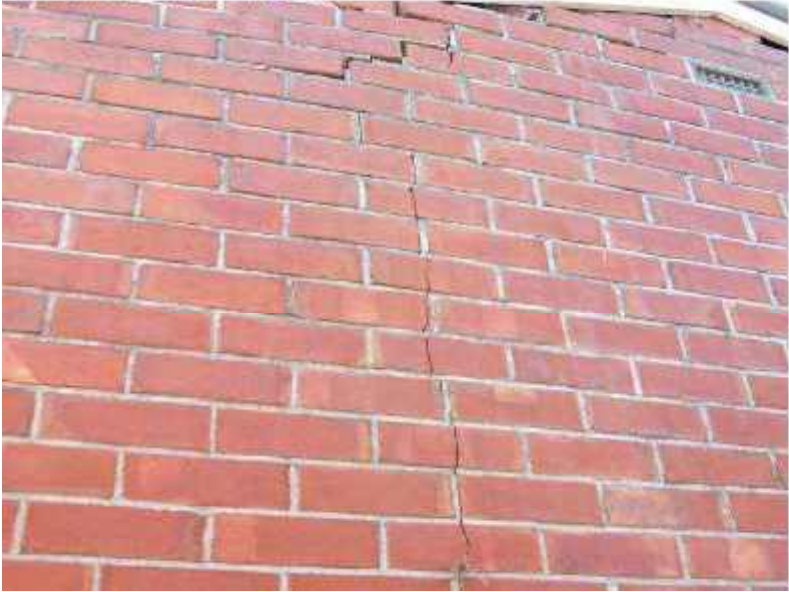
Moderate Vertical Cracking through Brick Veneer at Right Wall and Failing of Gable Bricks of Flat 7 (Photo 4 of 5) Looking Southeast
